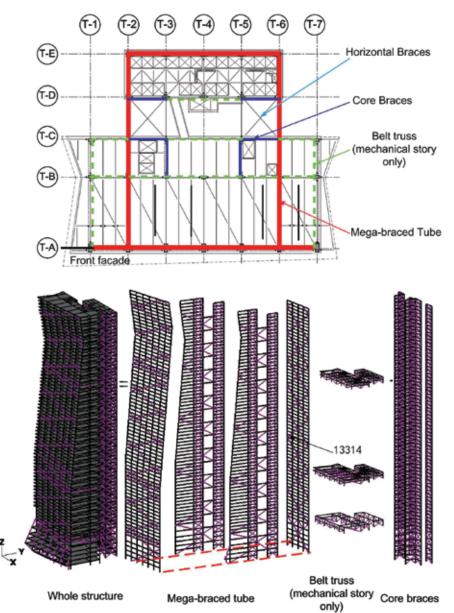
The Constitution of Structural System (Source: China Academy of Building Research)
